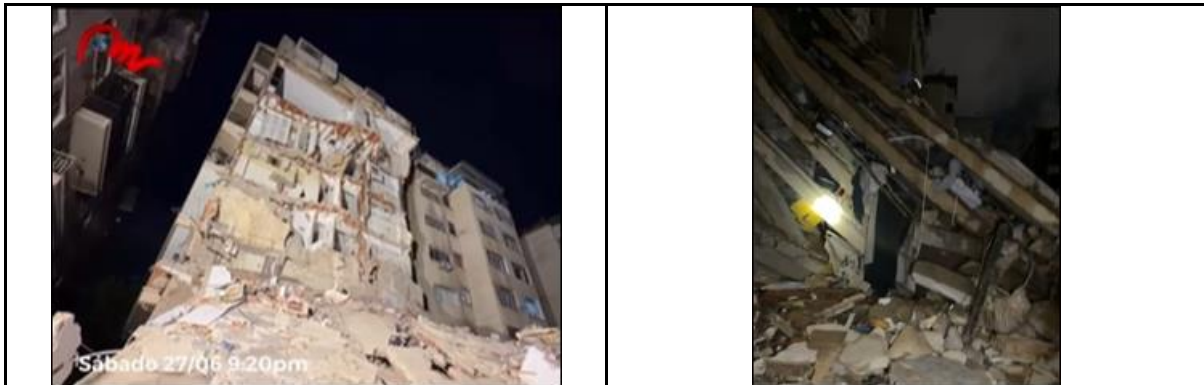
Edificio Don Pepe – a collapsed 7-storey residential RC building. In this building, only its back portion collapsed..
